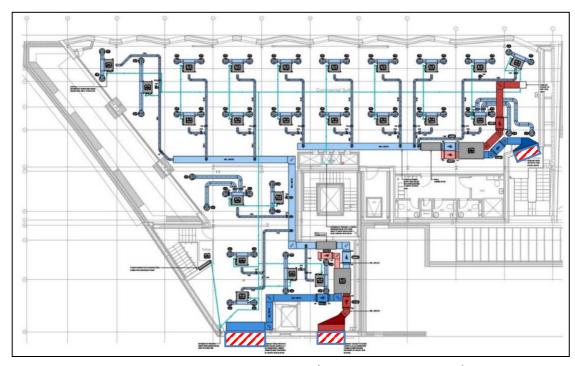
Proposed plant unit installation – First Floor (Image Source: QuinnRoss)
